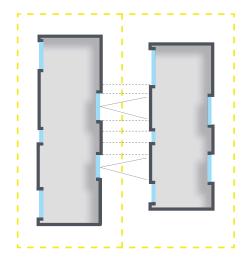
WINDOWS AND SIDE ELEVATIONS
